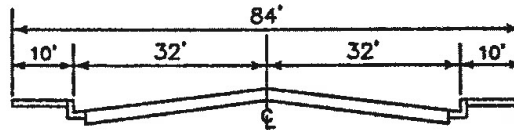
CITY OF CYPRESS GENERAL PLAN ROADWAY CROSS-SECTIONS
